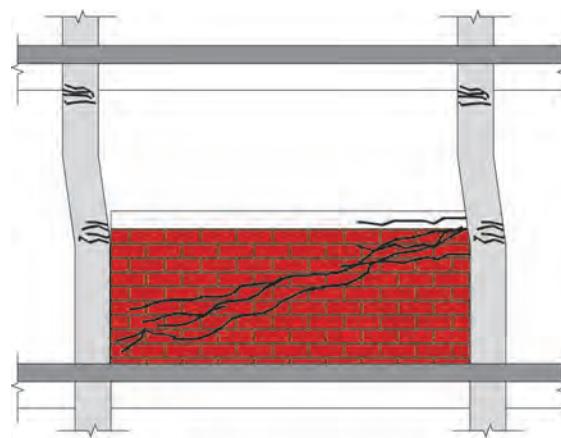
Shear failure of columns under shear forces induced by the inadequate arrangement of infill wall
